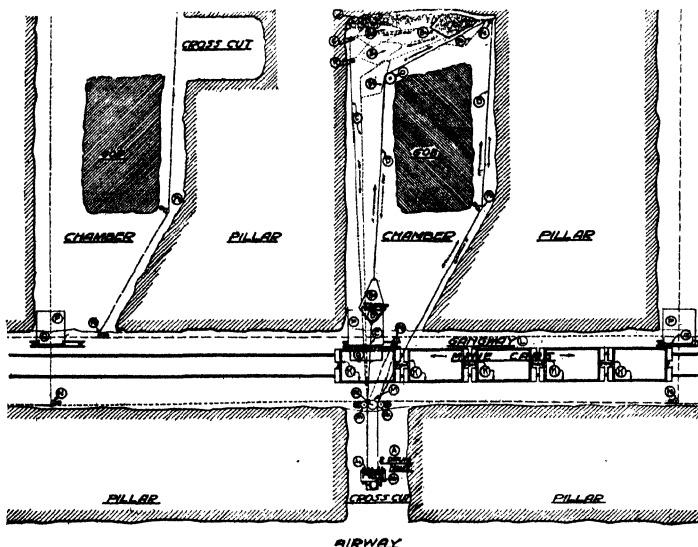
GENERAL LAYOUT OF TWO-DRUM HOIST AND SCRAPER LINE.
